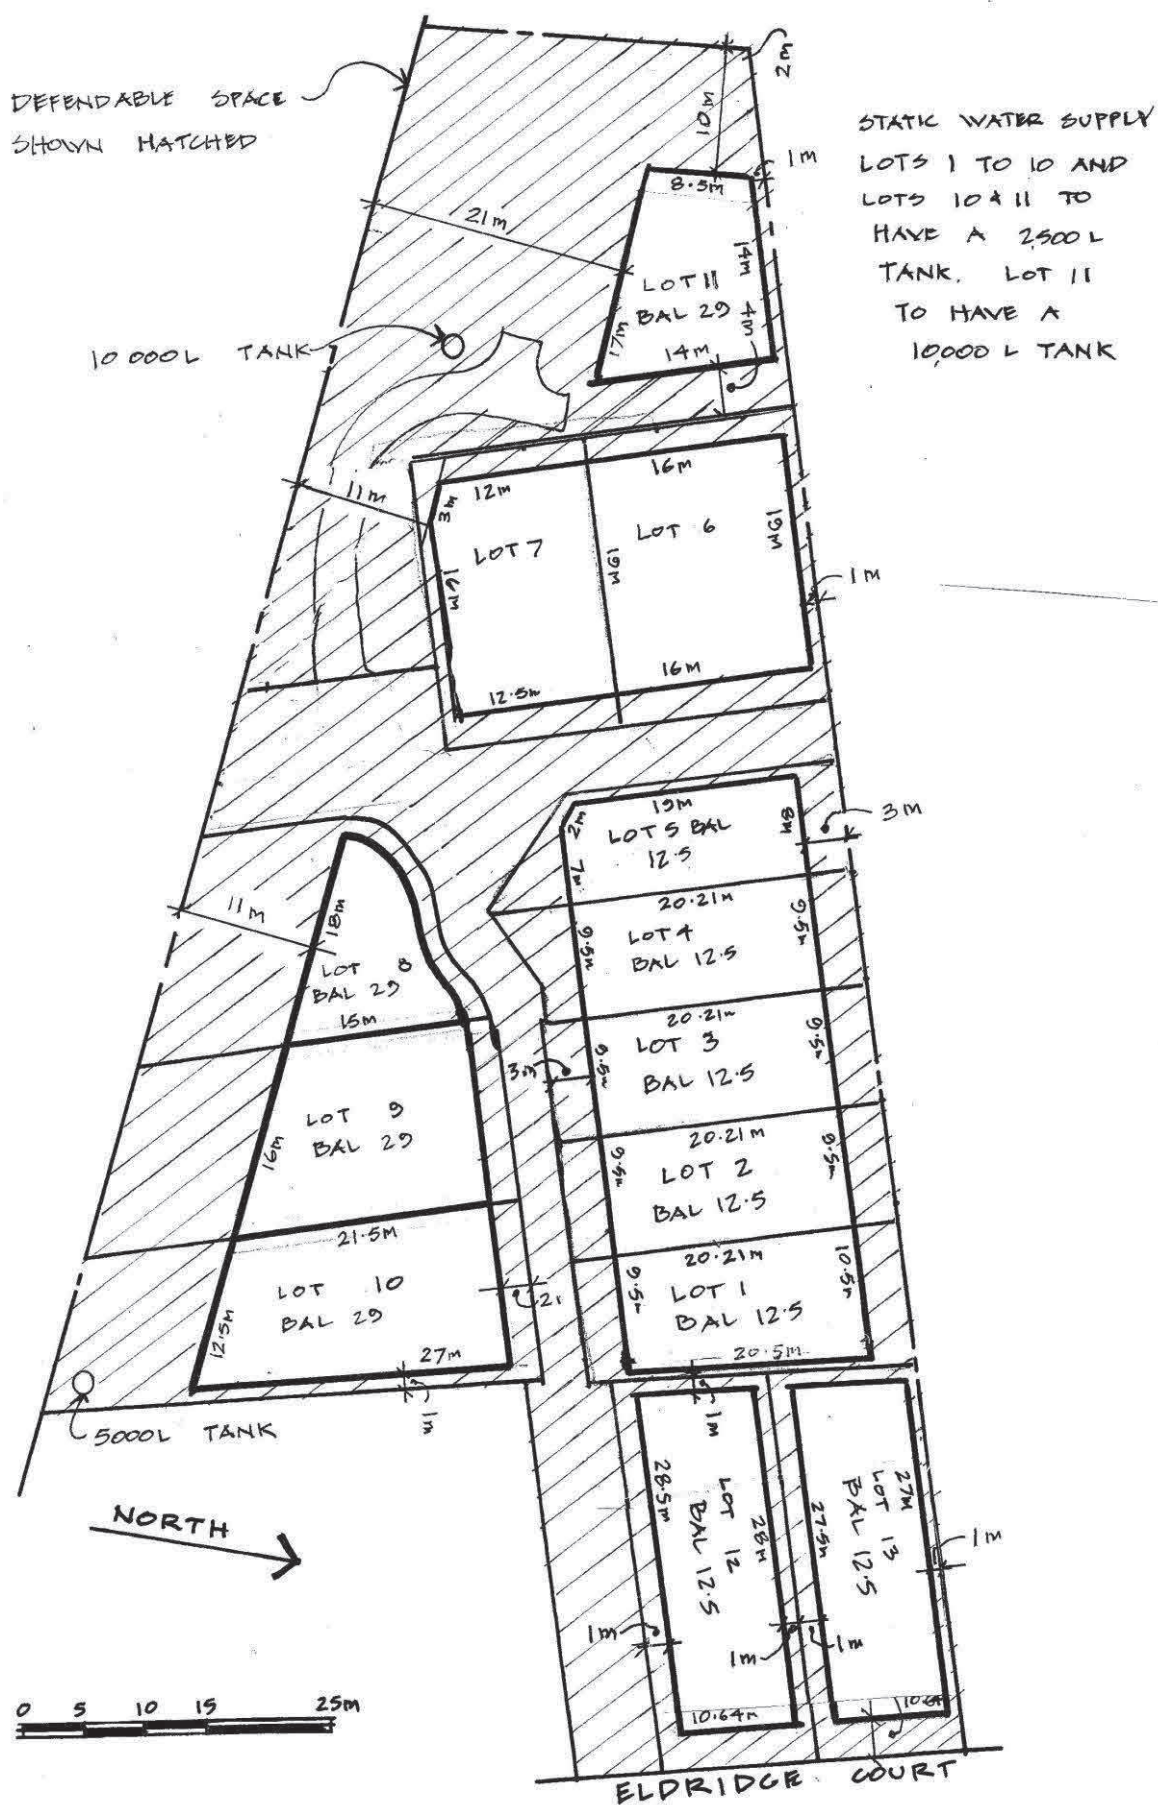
DEFENDABLE SPACE AND BUILDING ENVELOPES
